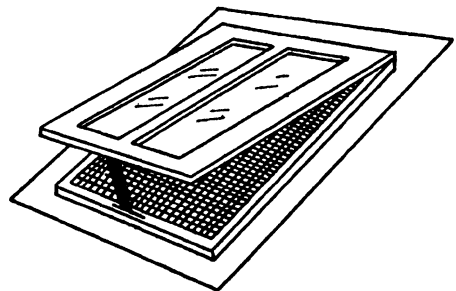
Roof windows are not hidden by stacks of equipment, provide more light, and can be opened for ventilation.
